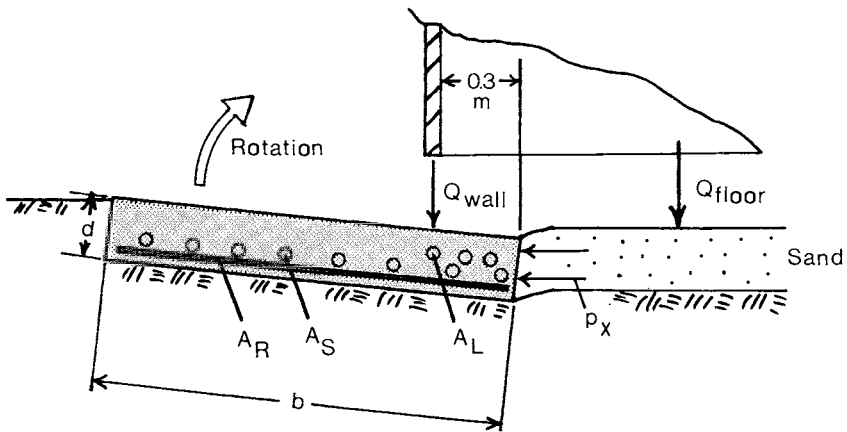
A section through a tower silo extended ring foundation showing the tendency for rotation, and the location of internal reinforcing steel (from Turnbull et al., 1983).
